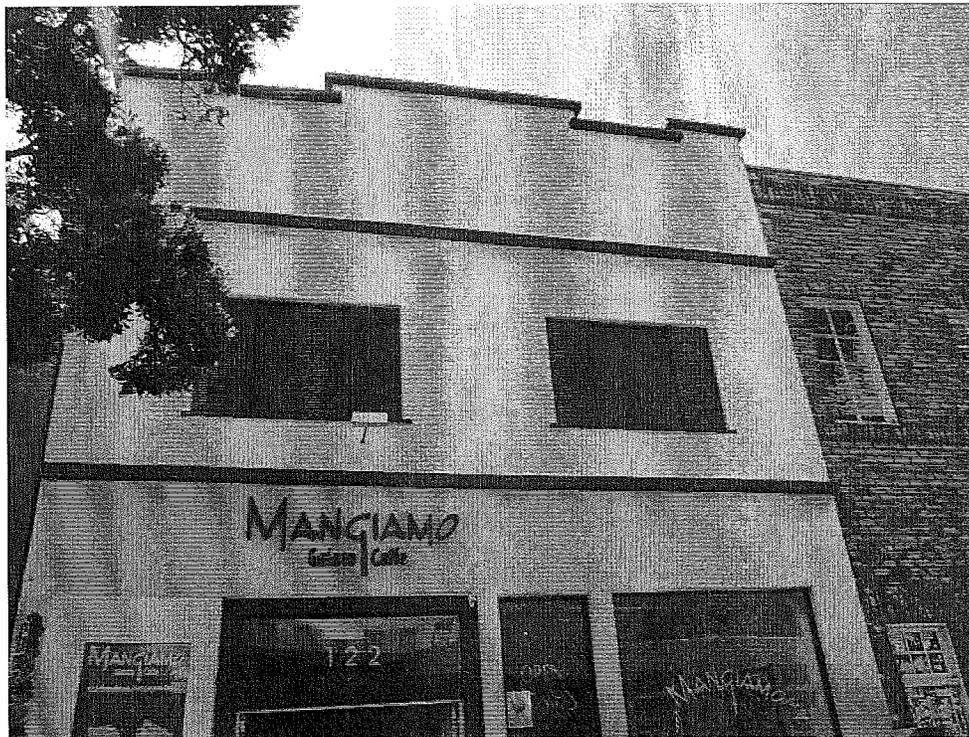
122 Main Street, Primary (north) elevation, view to south (PCR 2012)
